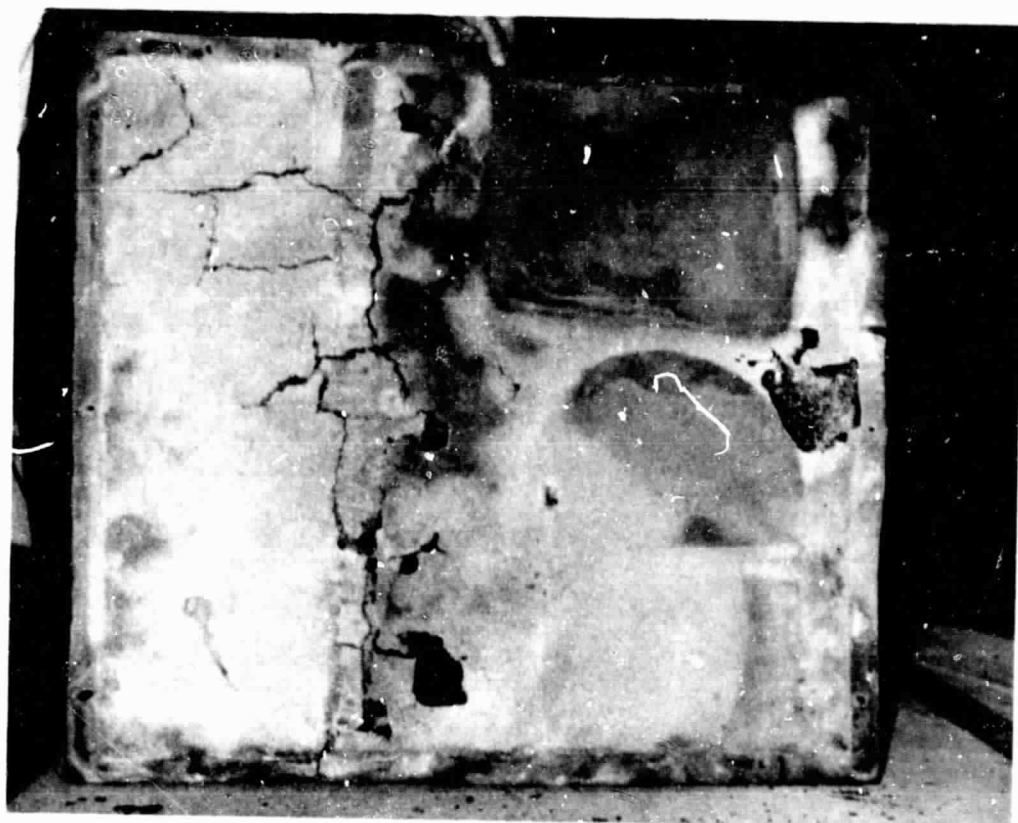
LEFT WALL OF MODULE B AND ADJACENT WALL
